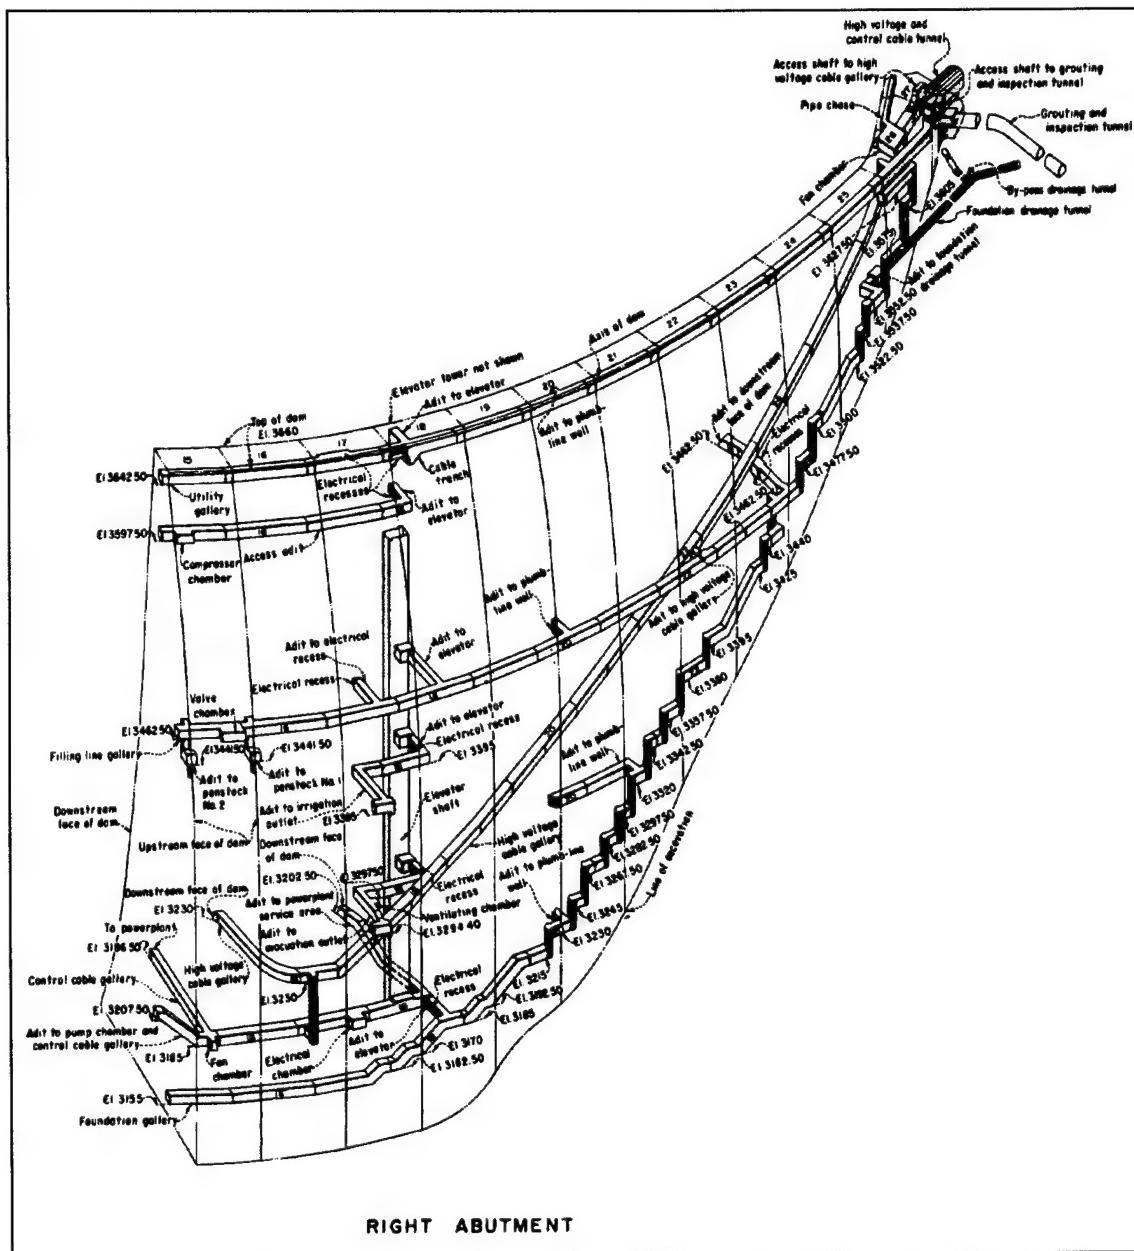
Gallery system in right side of Yellowtail Dam (USBR)
